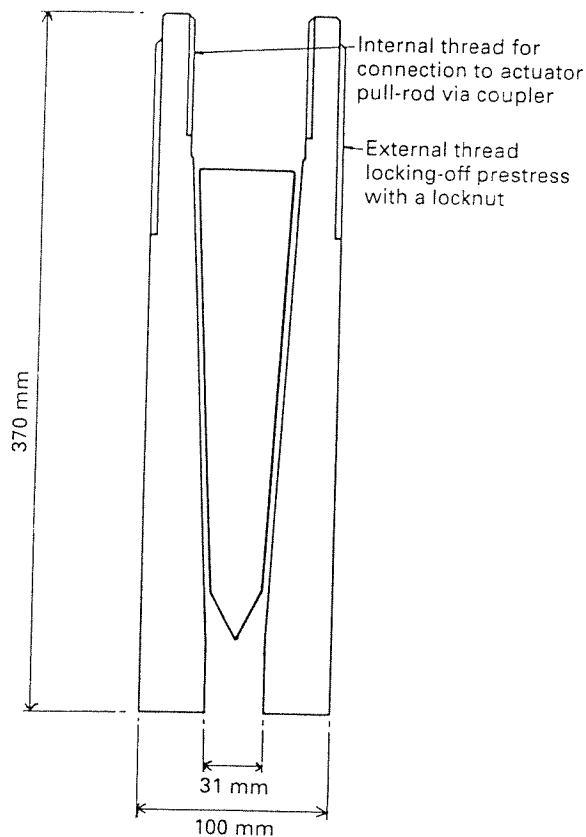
Section through a terminal for a 60 tonne Parafil rope, modified for connection to a jack for use in prestressing tendons
